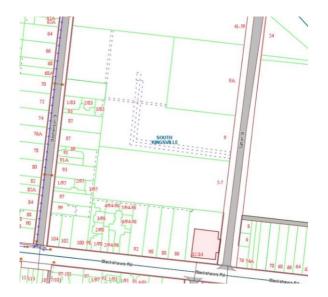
Hobsons Bay City Council Stormwater Asset Plan
